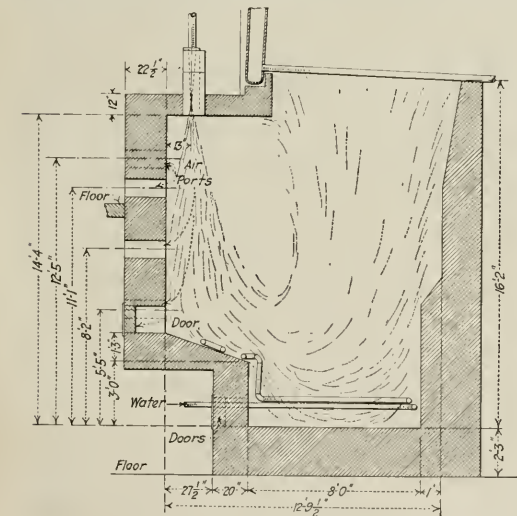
SECTION THROUGH FURNACE, SHOWING ARRANGEMENT OF BURNER AND COOLING COIL OVER HEARTH AND NEAR BOTTOM OF FURNACE
